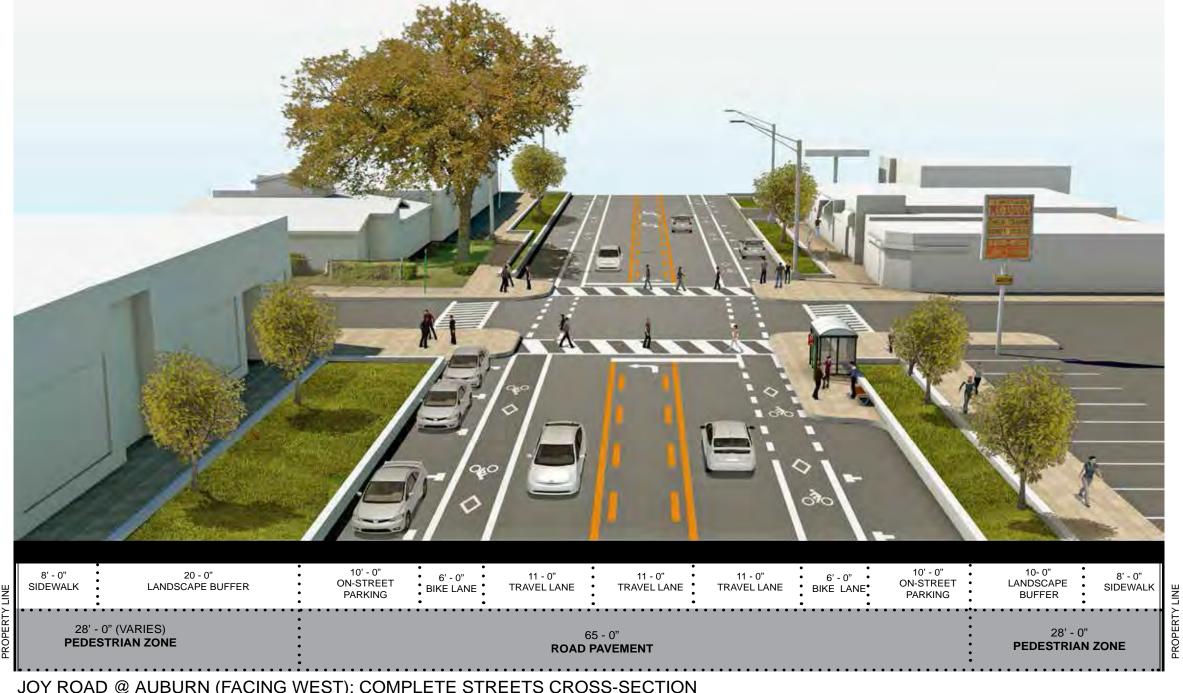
Joy Road and Auburn Road Intersection (Facing West)
